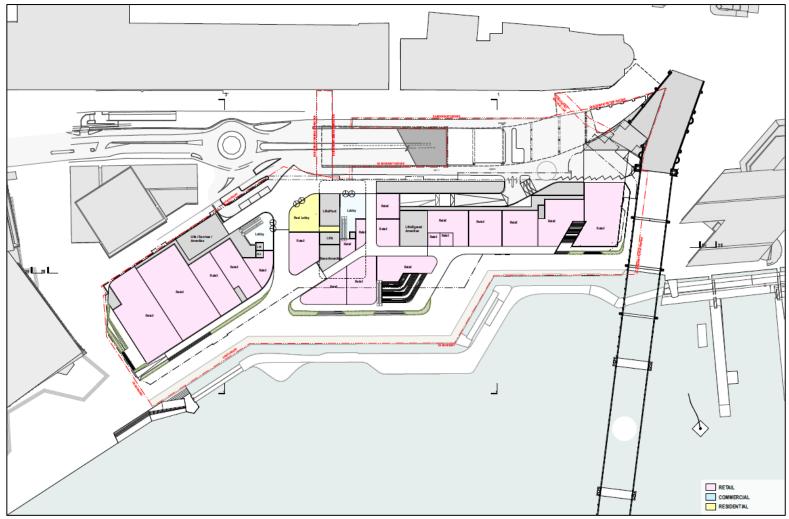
Indicative Plan Only – Ground Floor Retail (Source: fjmt, 28/09/2020)
